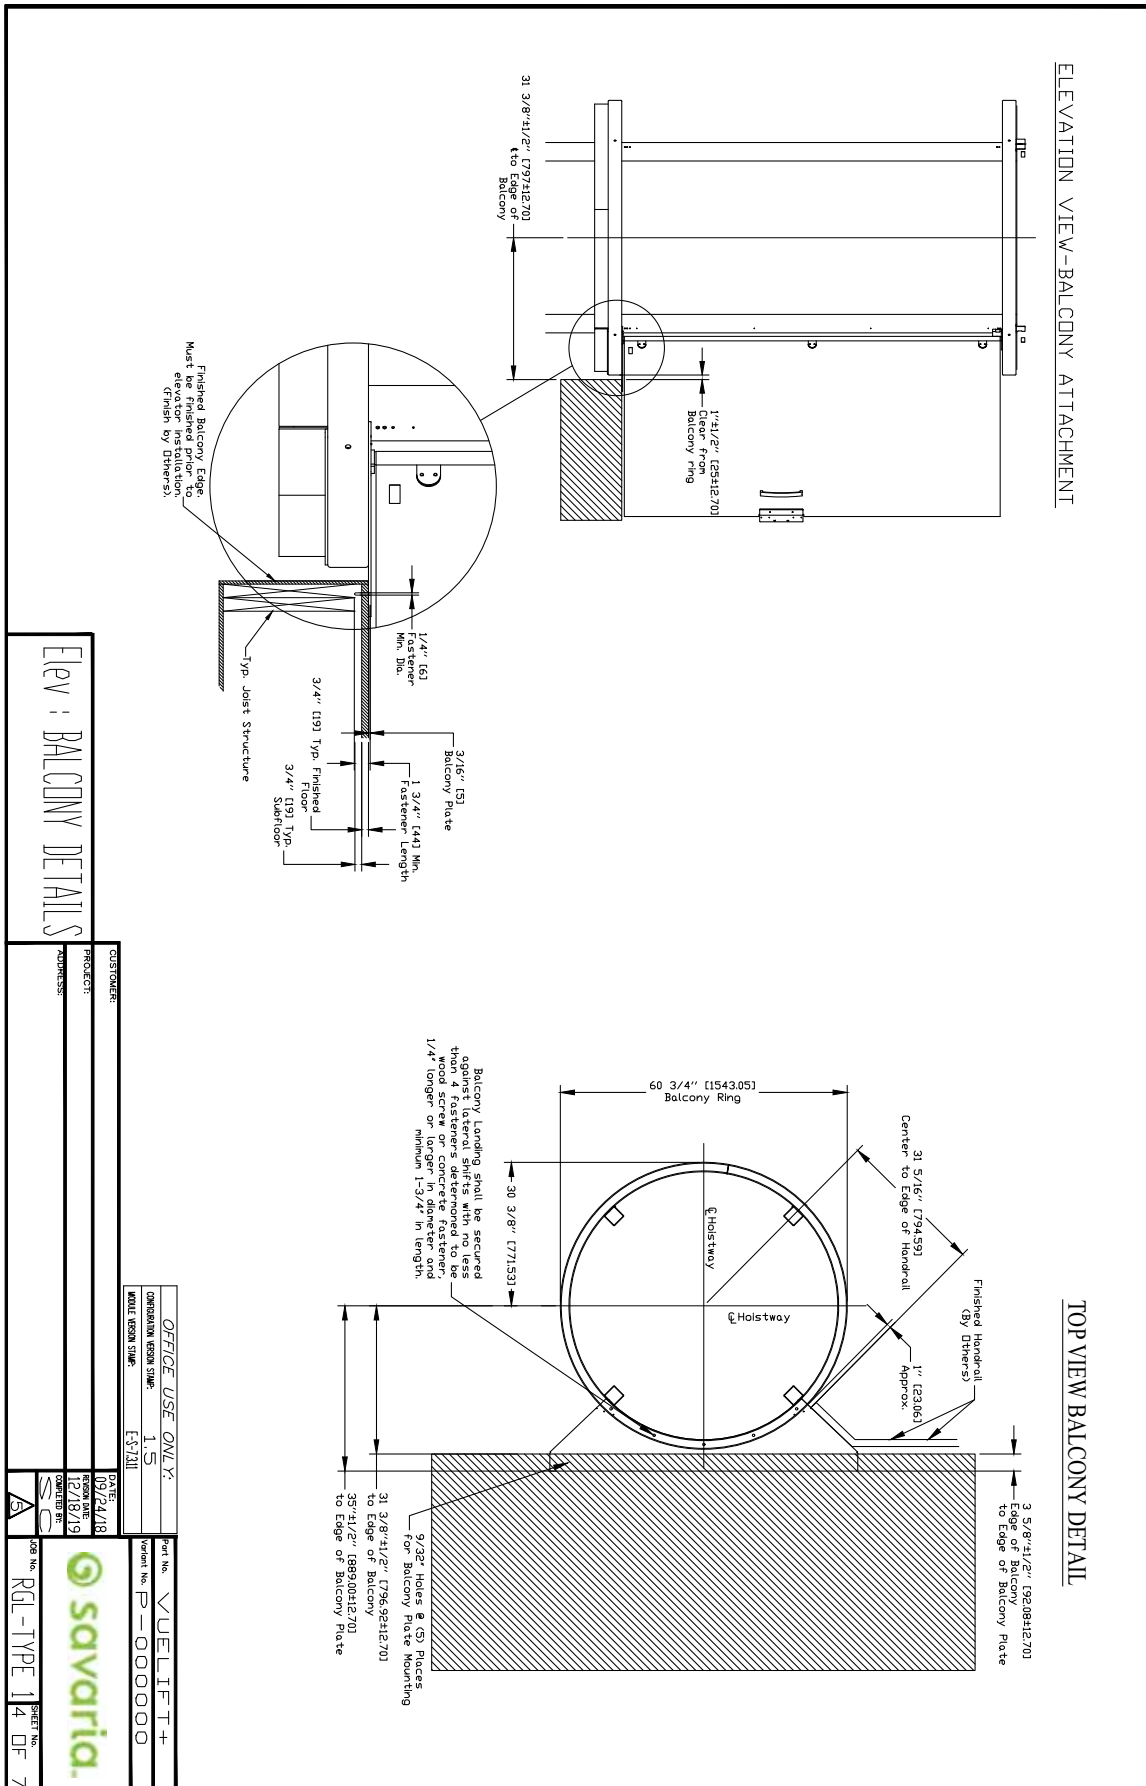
Balcony plate and handrail information - round+ glass (RGL)
